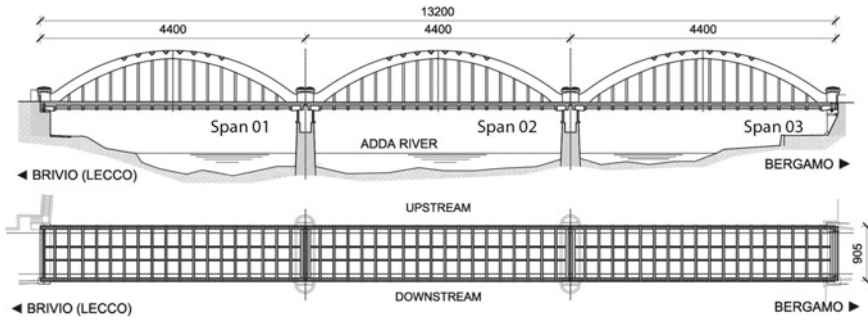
General arrangement of the Brivio bridge (dimensions in cm)
